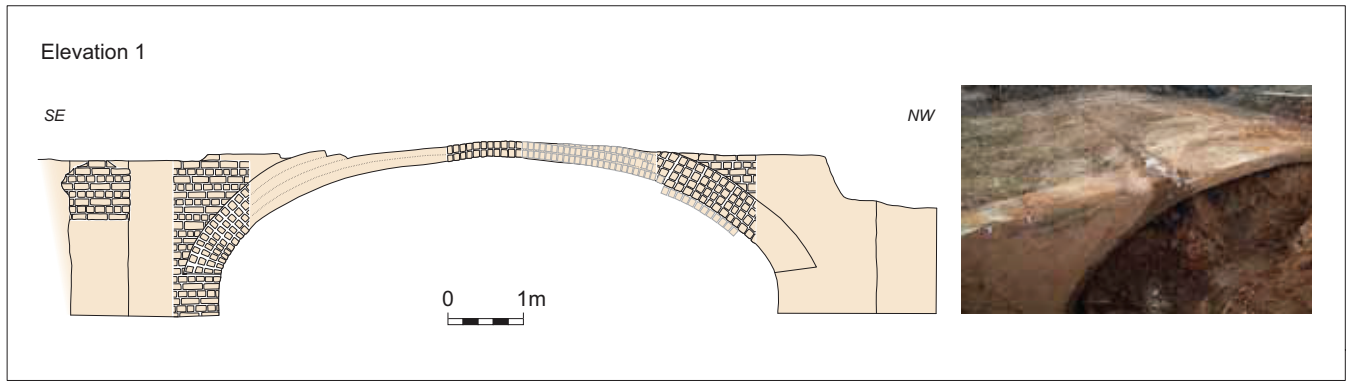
Elevation and view from the north-east of the infilled bridge over the canal
